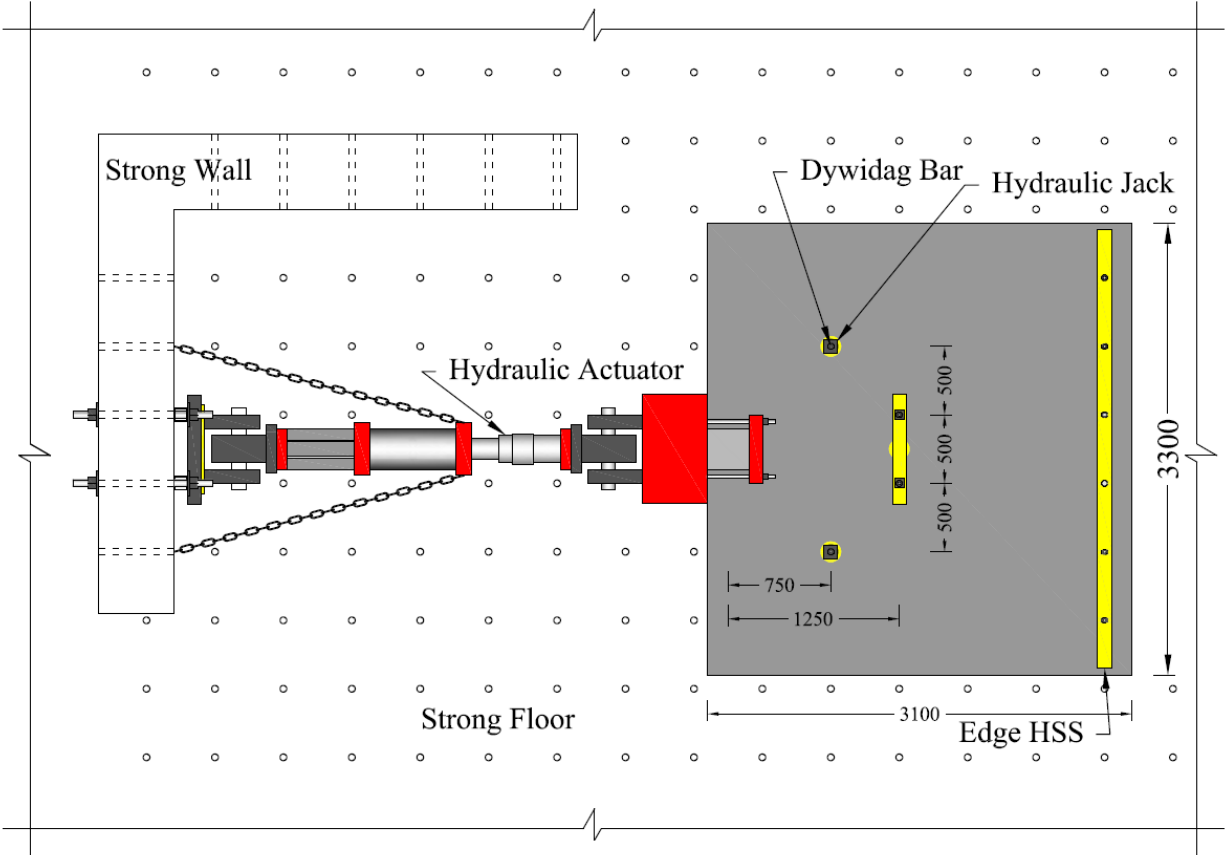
Schematic drawing of the test setup – plan view (dimensions in mm)
